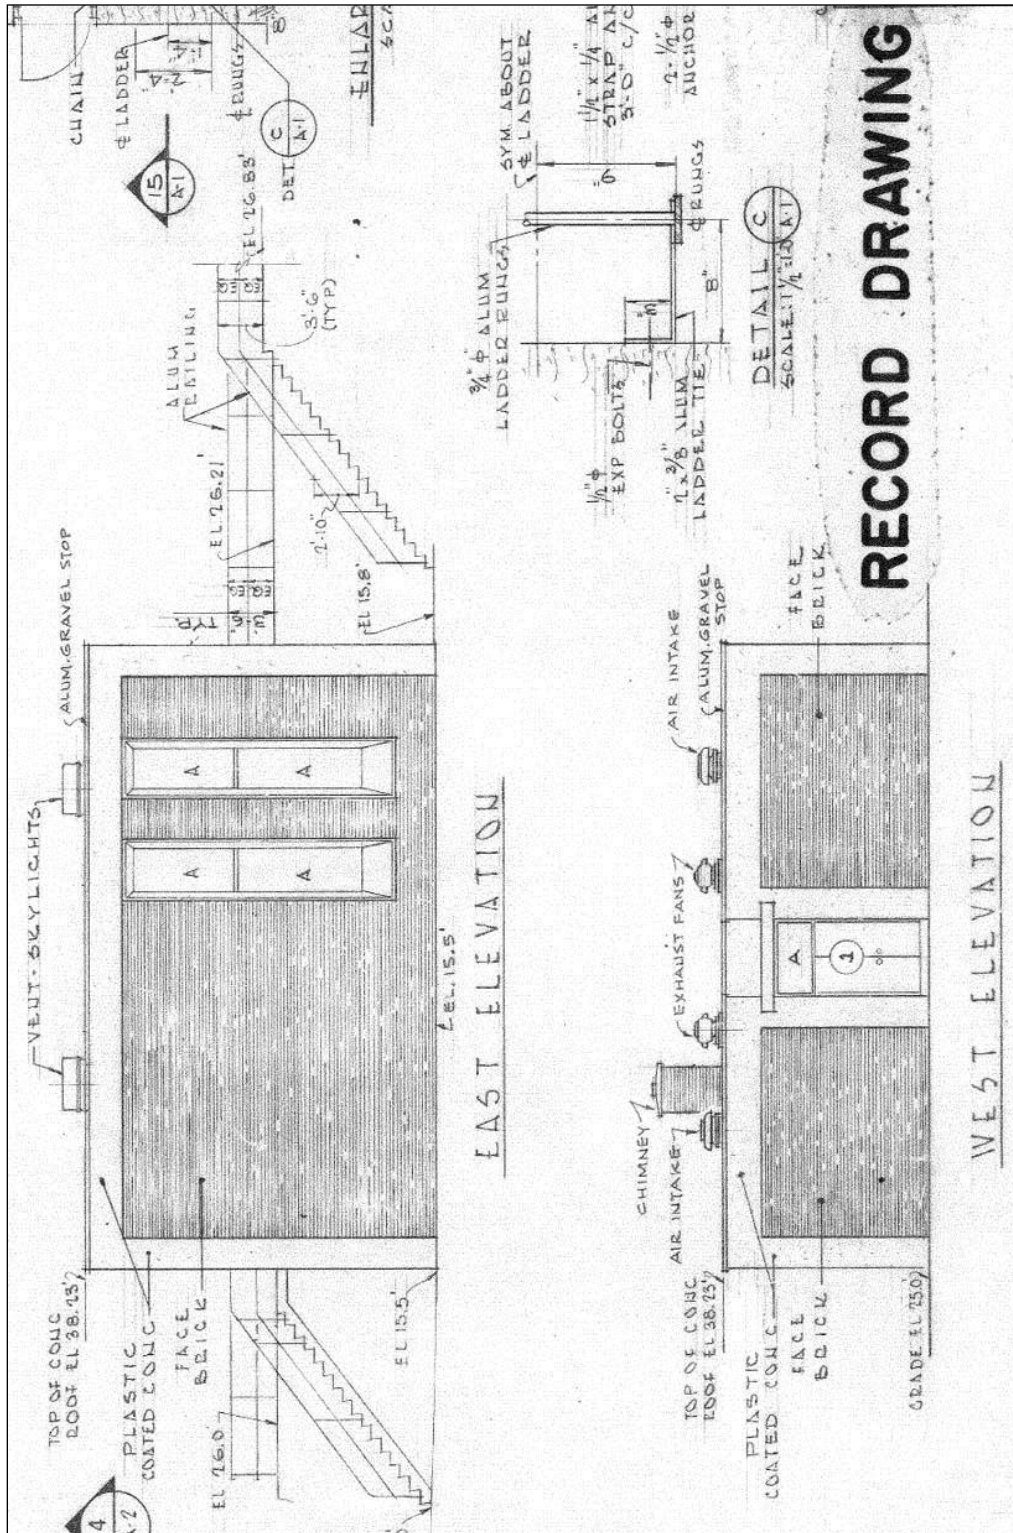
Record drawing of West (front) and East (rear) elevations of Portsmouth Sewage Treatment Plant Operations Building built 1965, converted to present Sludge Processing Building in 1993. Clip from sheet A-1, Operations Building, Plans and Elevations (Metcalf & Eddy, 1963).
